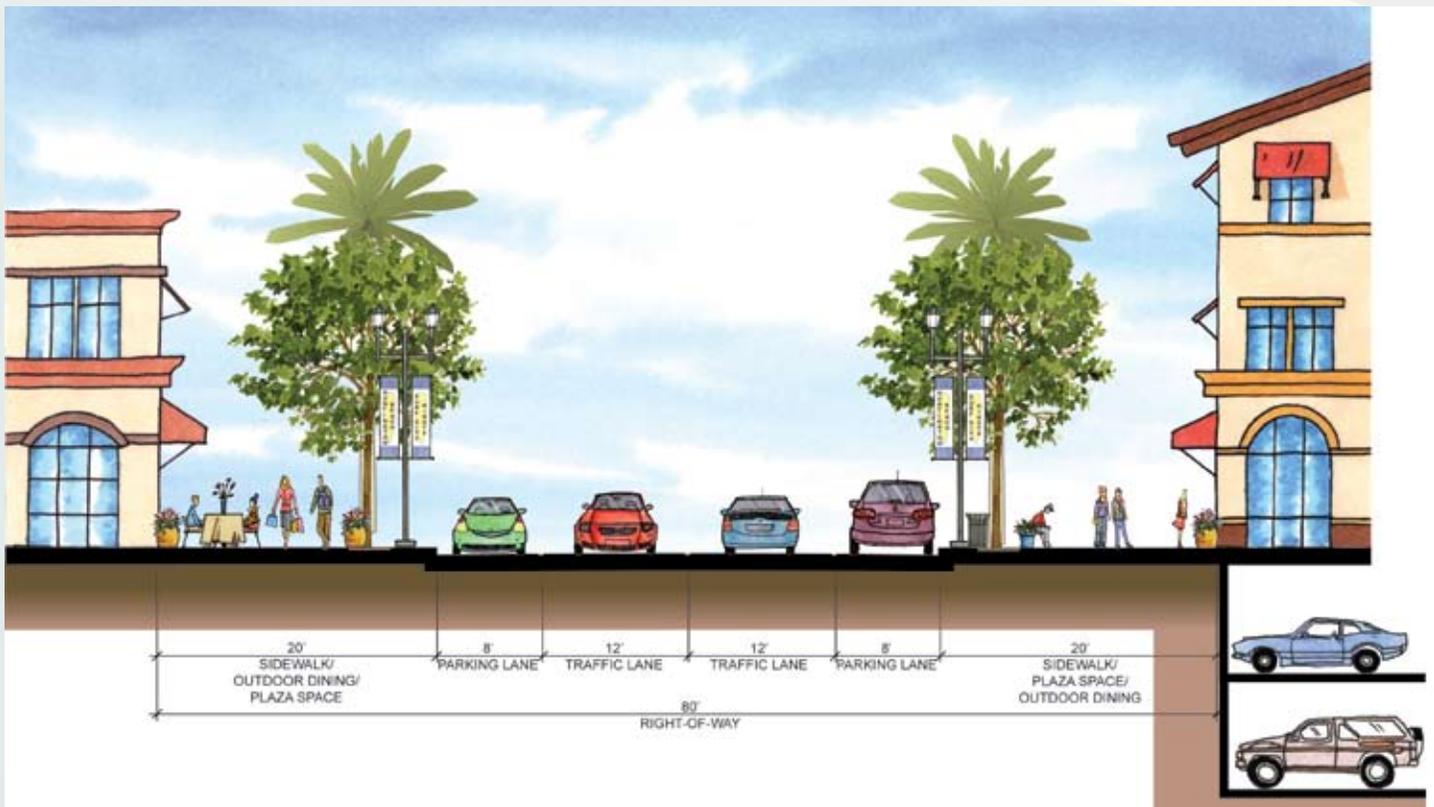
Cross section of 5th Street between Walnut Avenue and Orange Avenue
